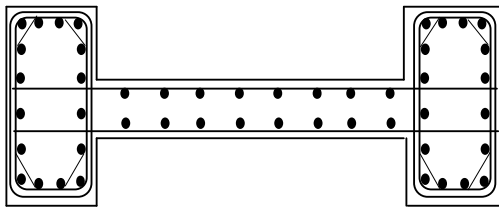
Bar bell shaped shear wall with boundary elements
